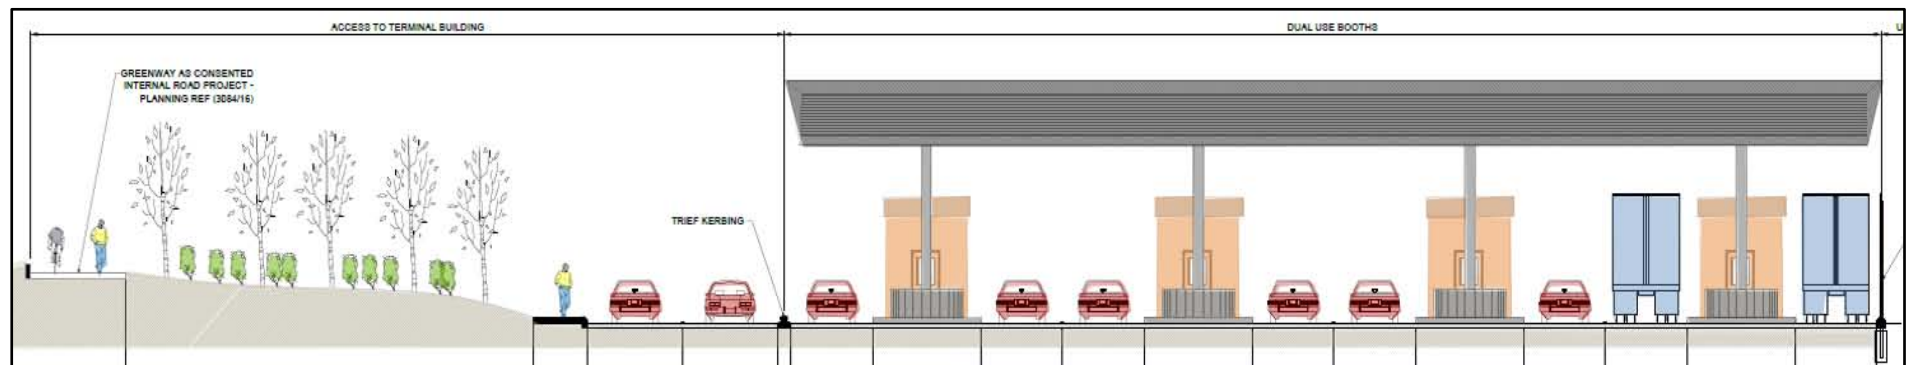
Cross Section 2 of Multi-use Booth Check-in
